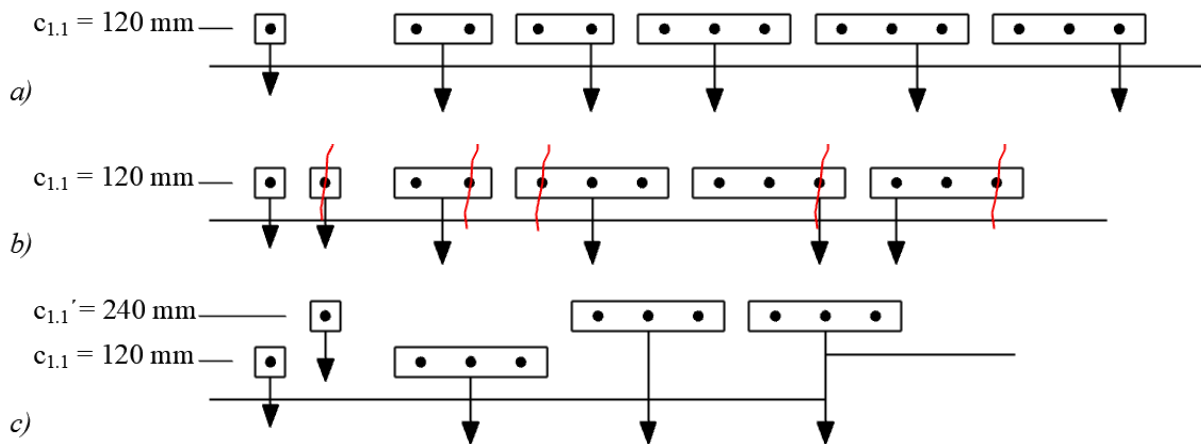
Tested configurations for anchor groups arranged parallel to the edge and loaded perpendicular to the free edge with the corresponding reference single anchor tests: a) anchorages in uncracked concrete; b) anchorages in cracked and uncracked concrete; c) different edge distance within an anchor group
